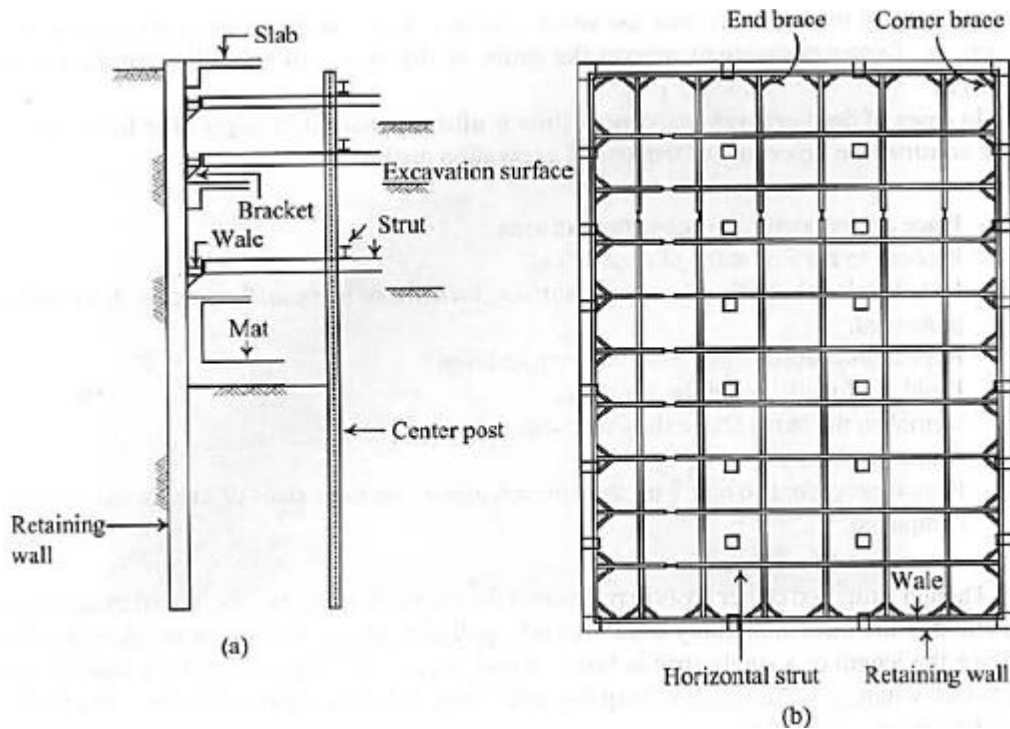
Braced excavation built following a bottom up sequence, (a) typical cross section and (b) typical plan view. After (Ou 2006).
